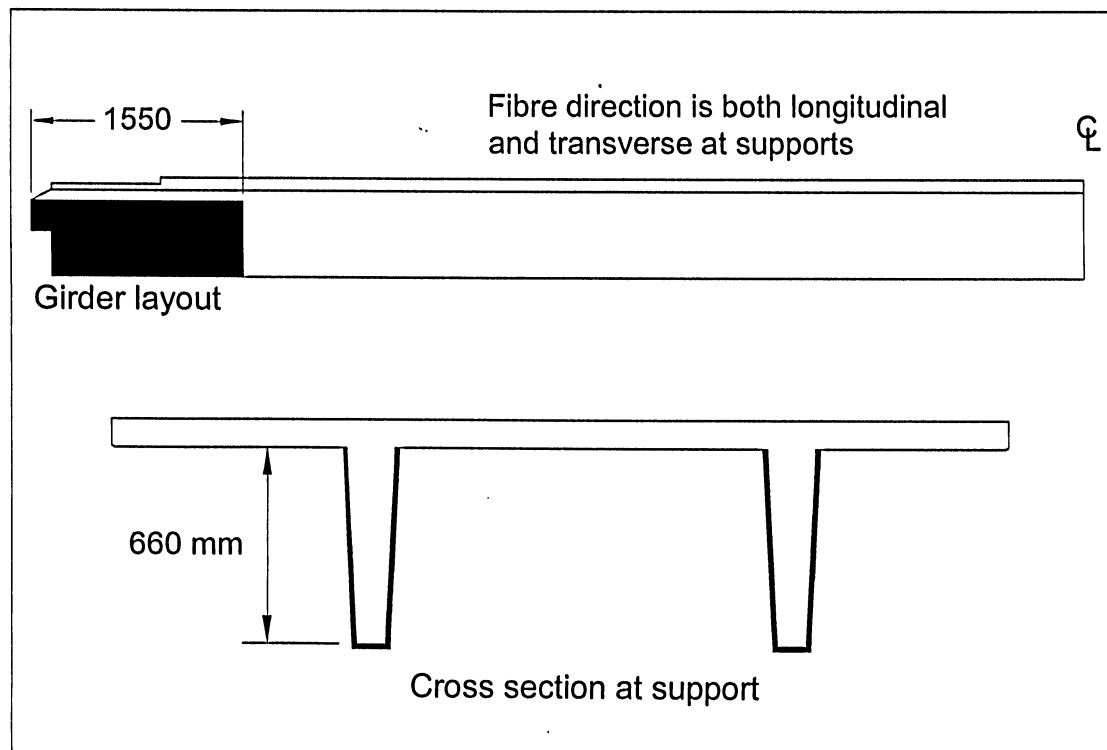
DT-100 girder CFRP layout (Cofini 2005)
